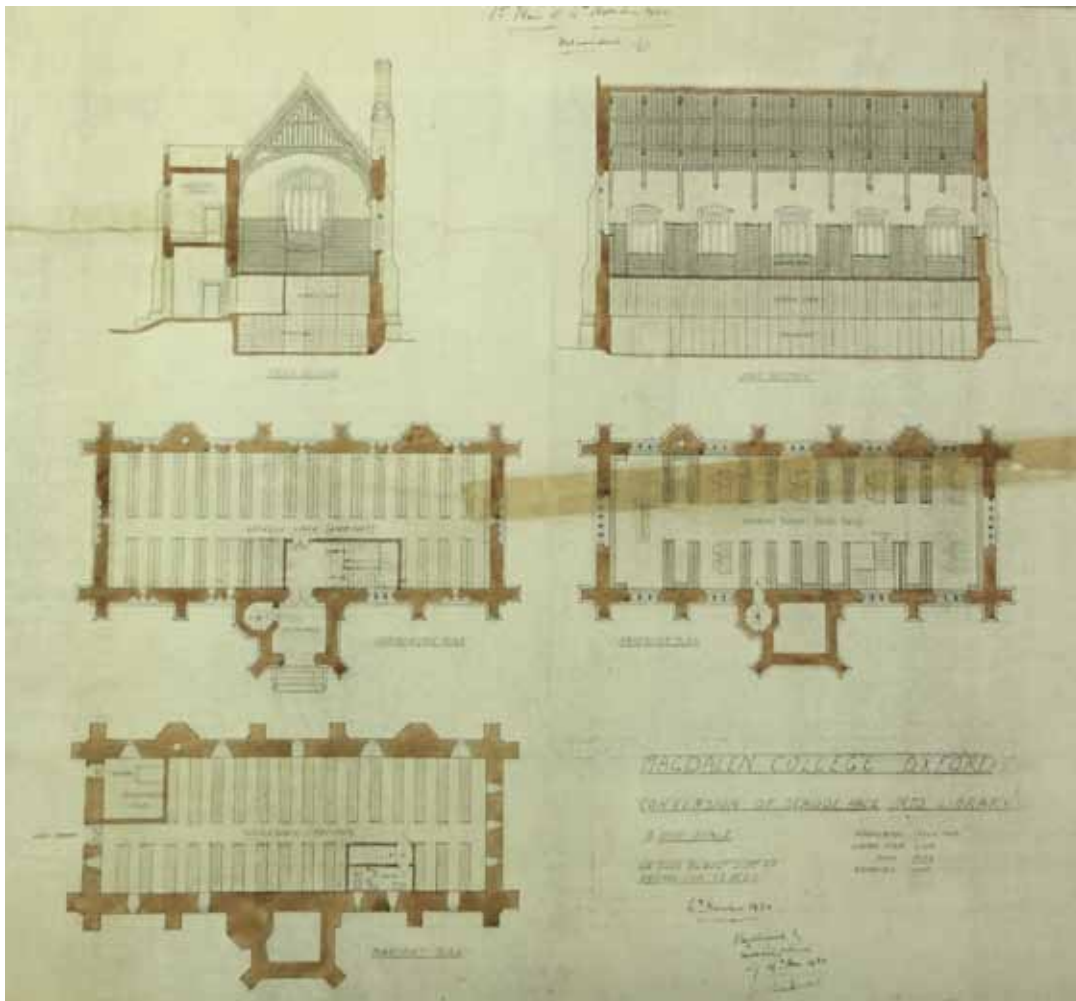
Plans and sections of Magdalen College Library. Magdalen College Archives.
